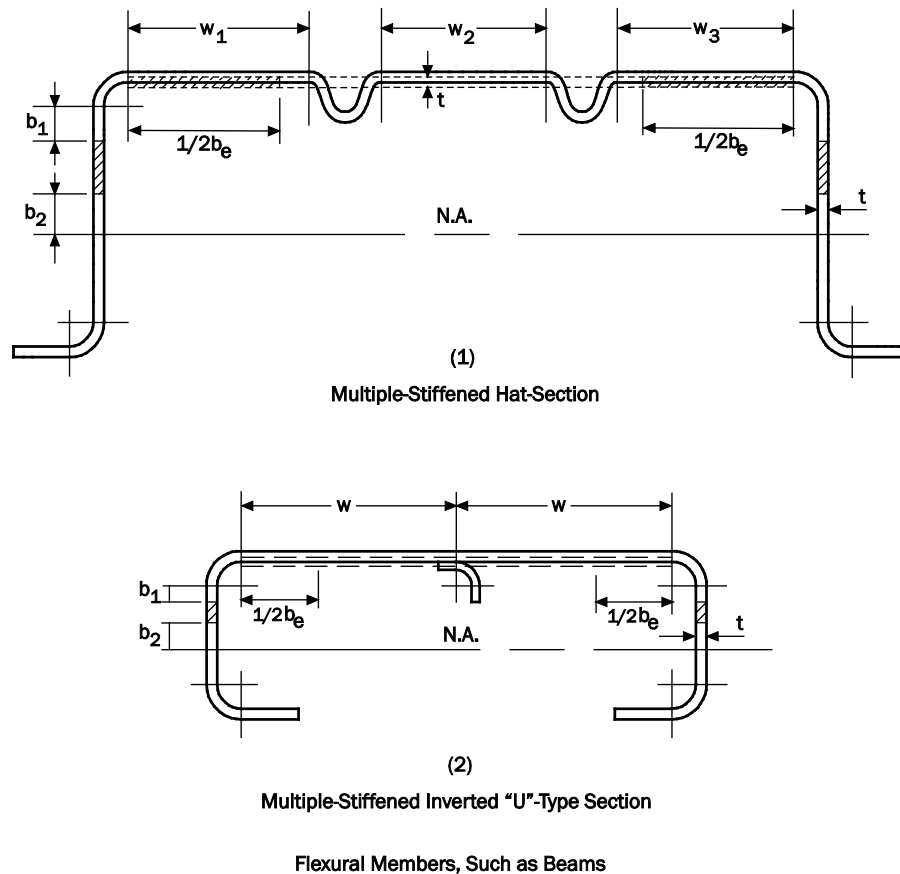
Multiple-Stiffened Compression Elements
